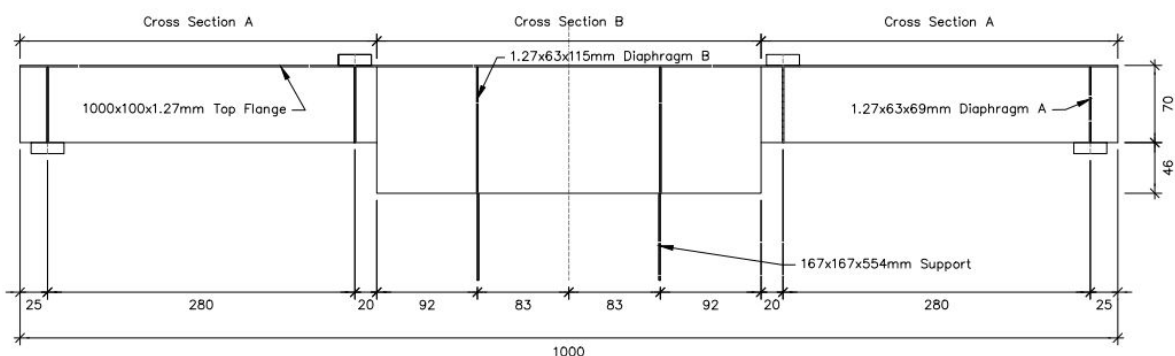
The Longitudinal Cross Section of the Concept 1 Bridge
